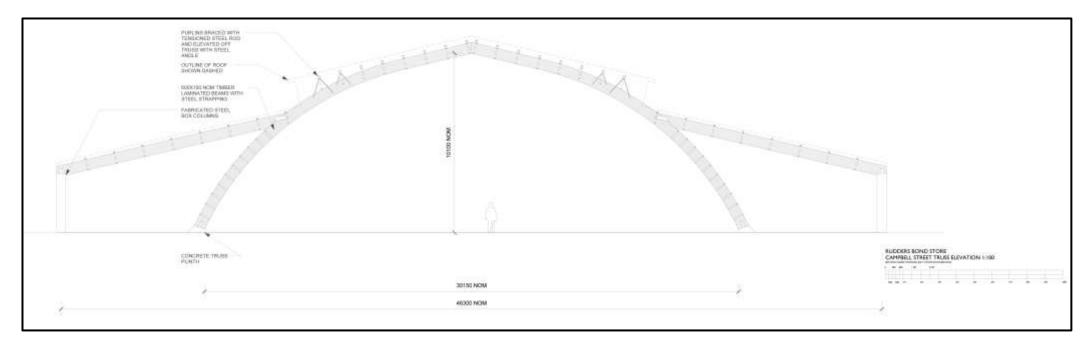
Section plan of laminated timber arch (Source: The Archivist, Drawing No RBS\_MD-03, Issue 21.07.16).
